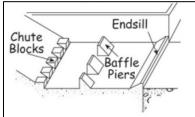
Stilling basin (Outlet Erosion Control Structures, n.d.)
